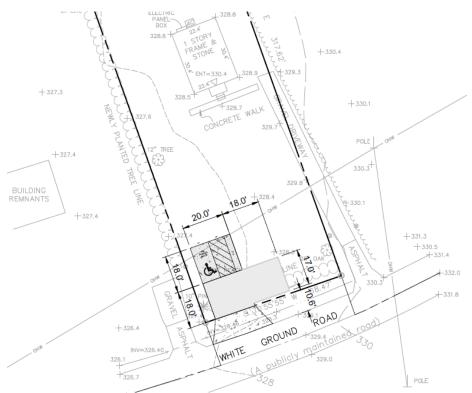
Proposed site plan, note the existing asphalt drive is on the neighboring property.
